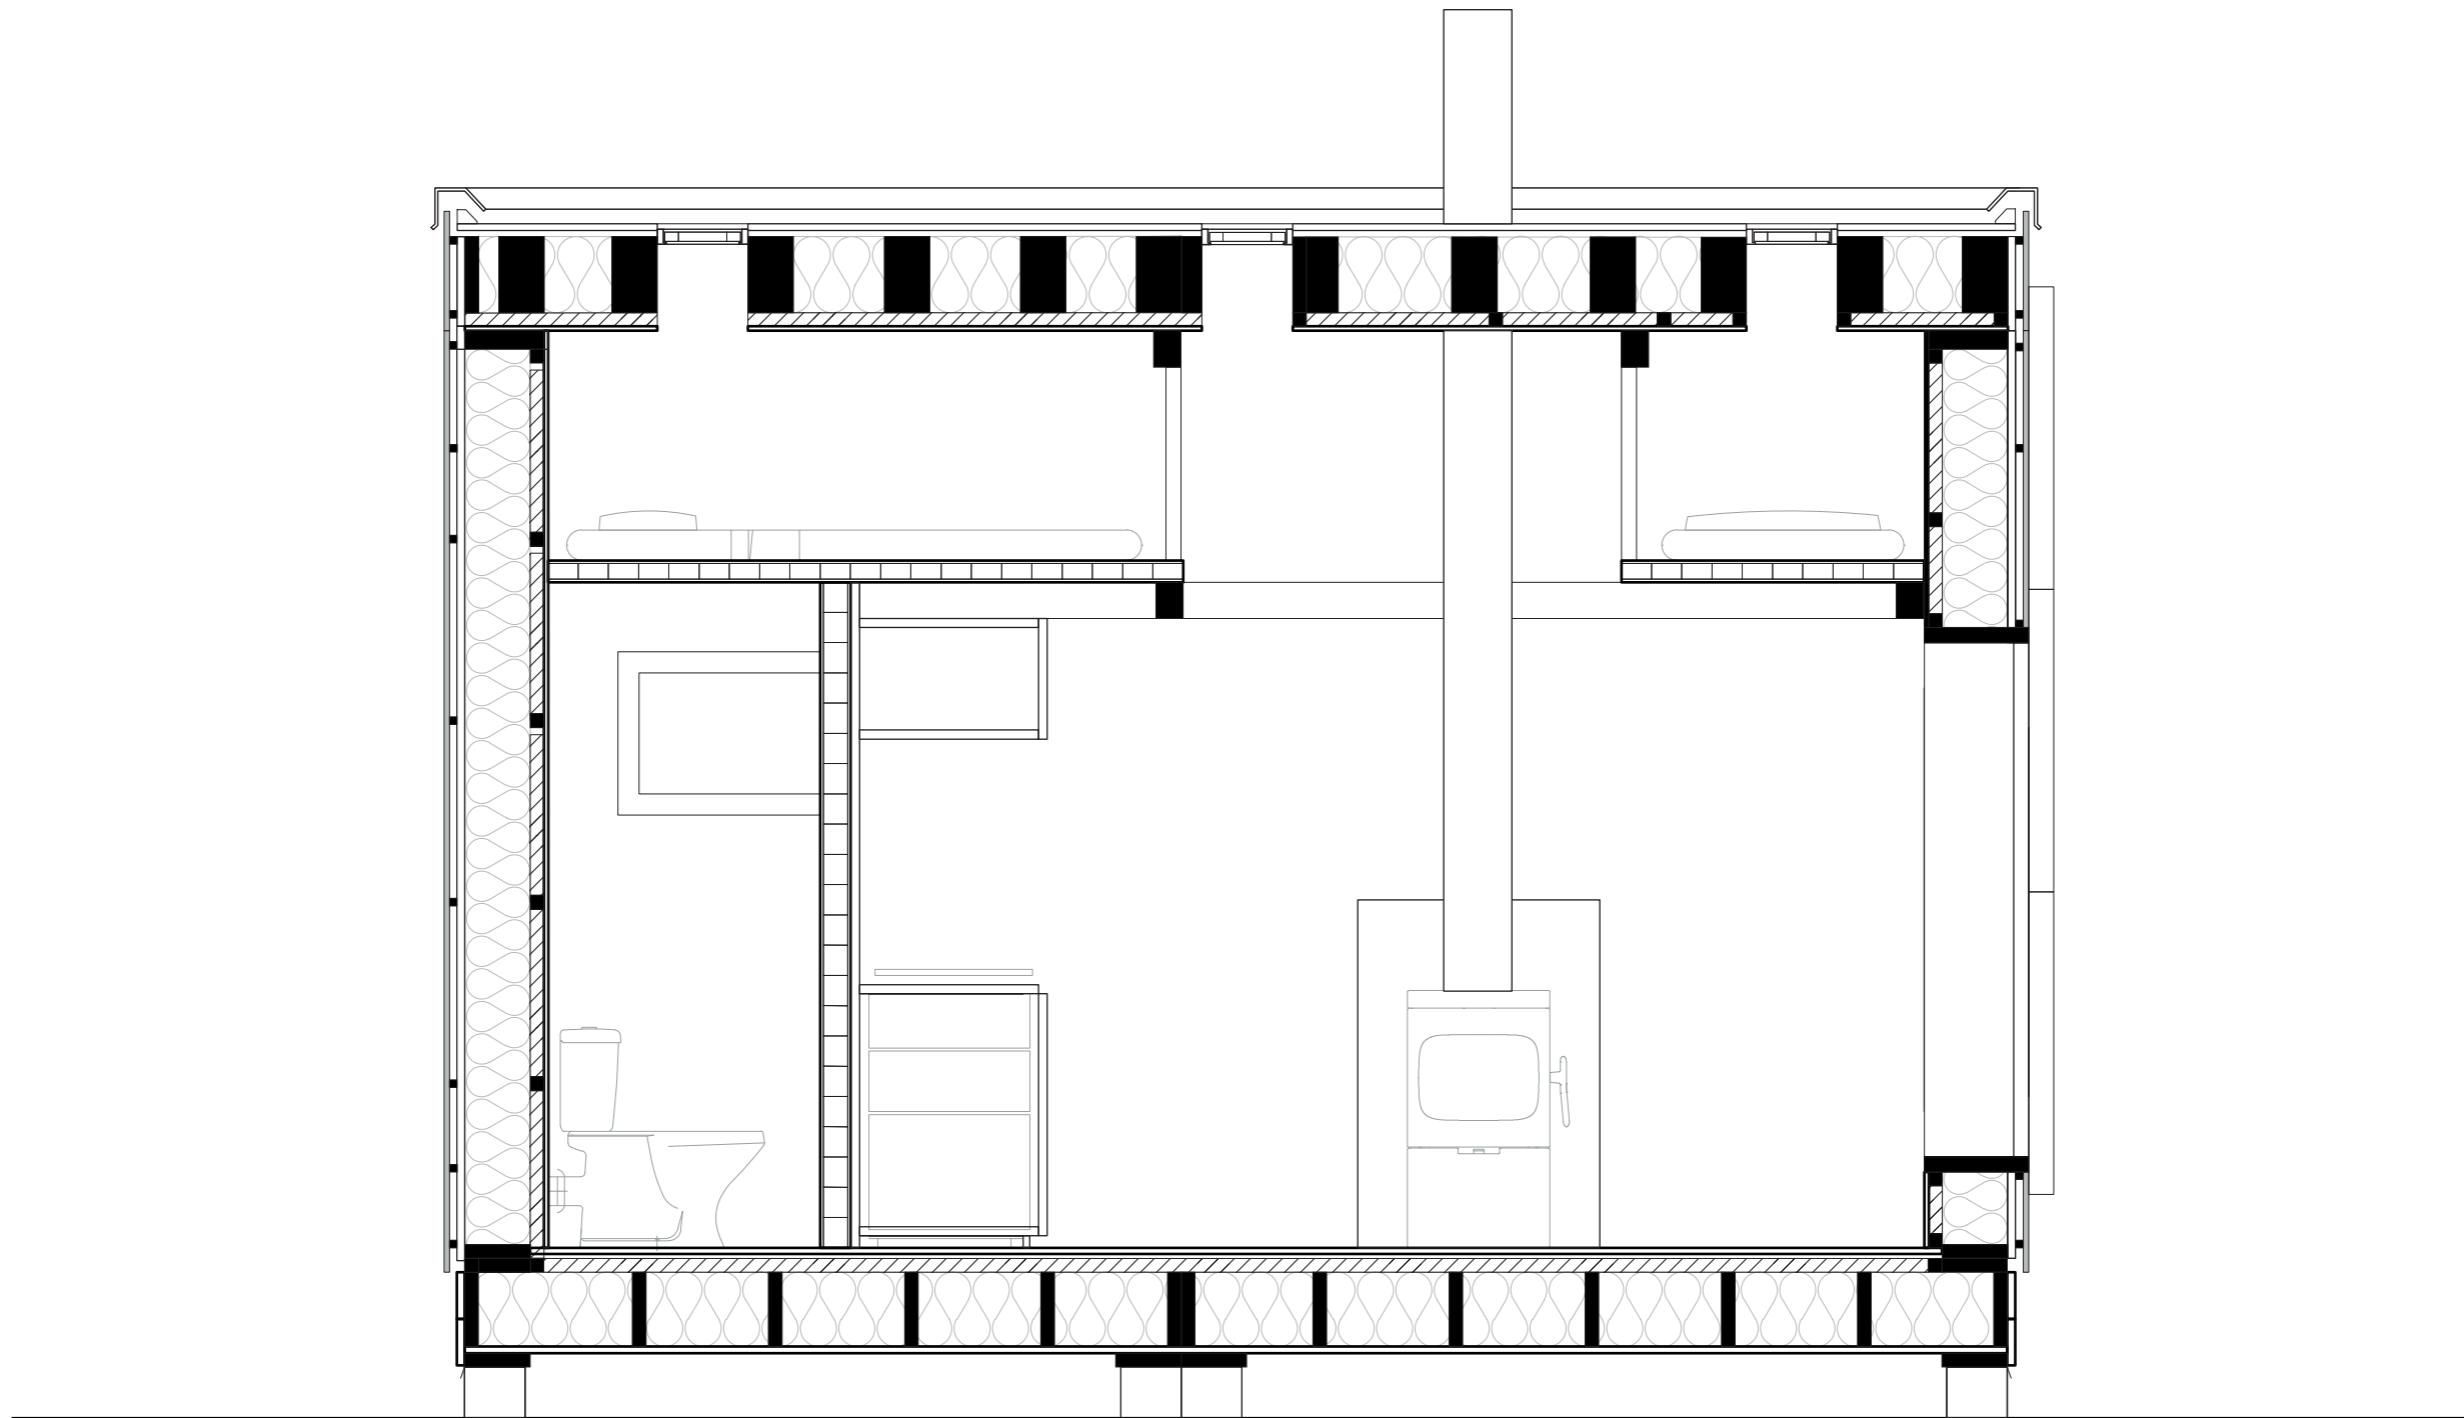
Section D SC 1:25 [AutoCAD and Illustrator]
